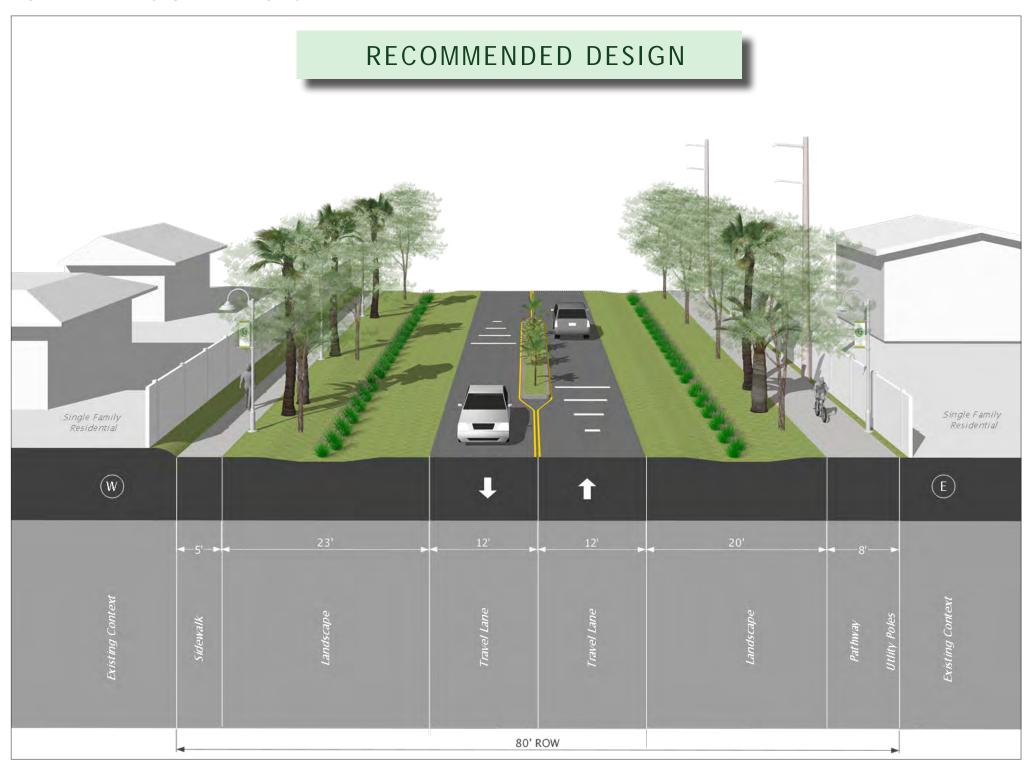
Diagram of recommended improvements for Sherwood Forest Boulevard.
